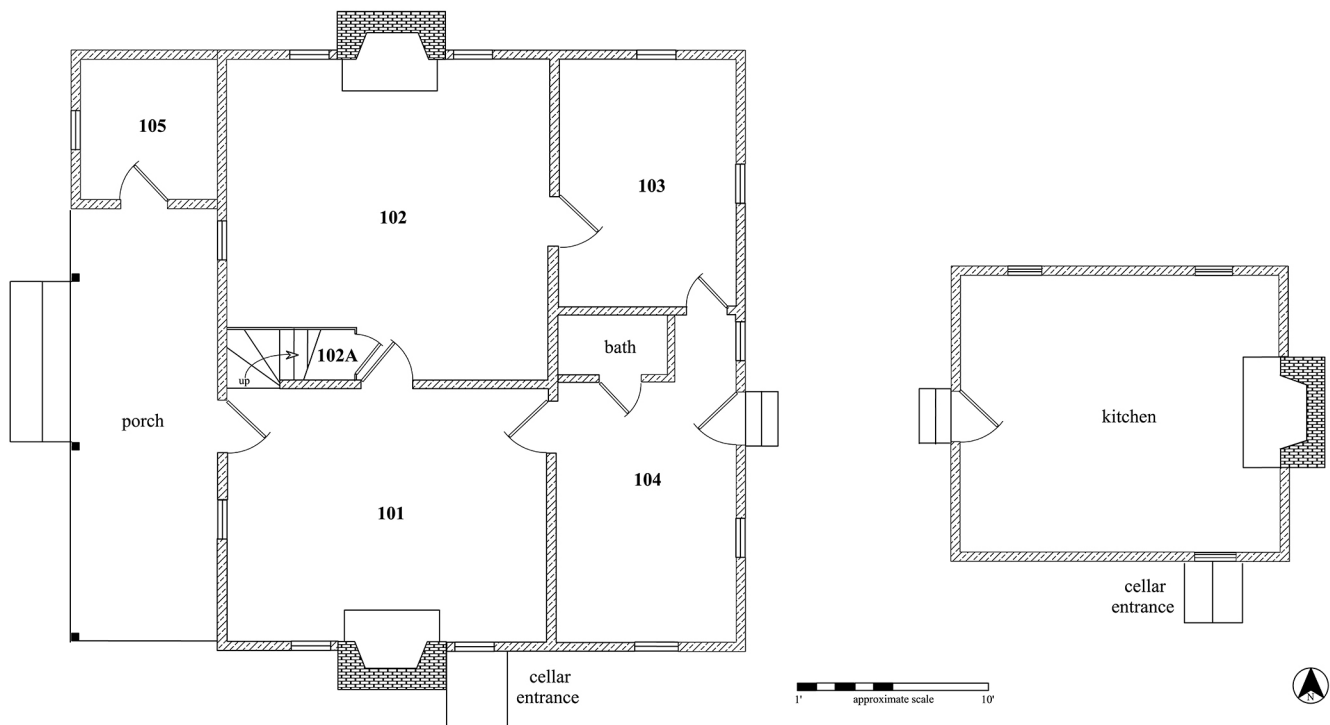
Floor plans of the existing house and kitchen. (T. Jones, 2019)
